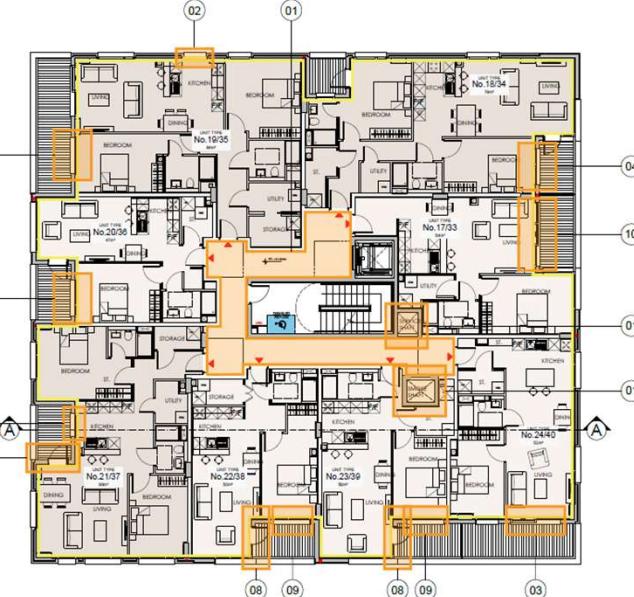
Existing Second & Fourth Floor Plan – Extracted from Existing Scheme
